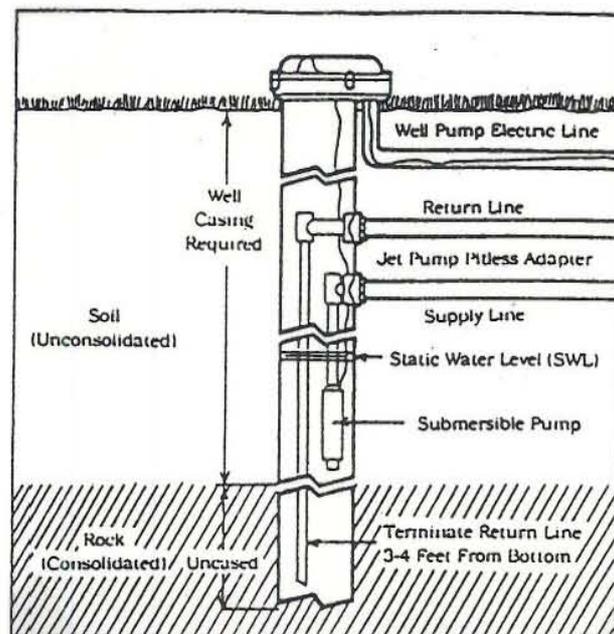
Cross-section view of geothermal well (source: Water-source Heat Pump Book)
